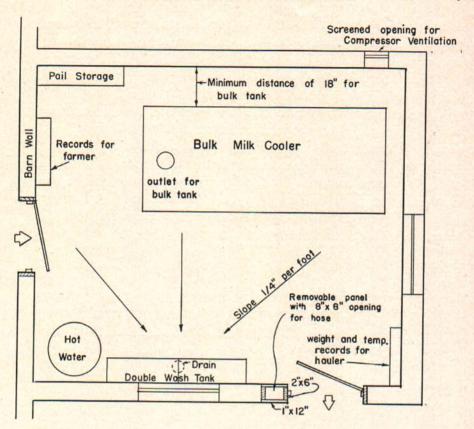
Suggested layout for milkhouses with doors on adjoining sides. (See Table 1 for dimensions.)
